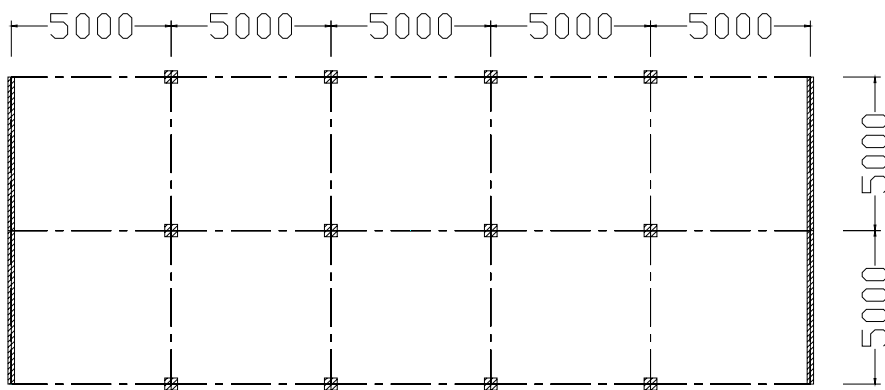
Shear walls are placed at both end of the building in the short direction
